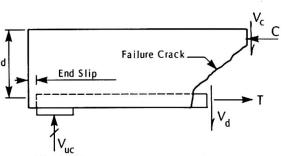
Forces at ultimate crack of typical shear-bond failure
